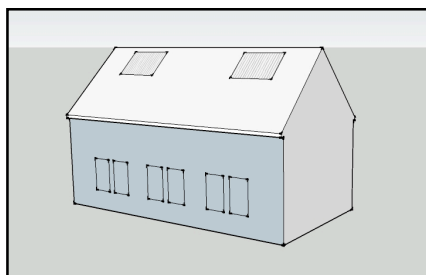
Panels placed on upper 2/3 of roof and aligned with windows.
